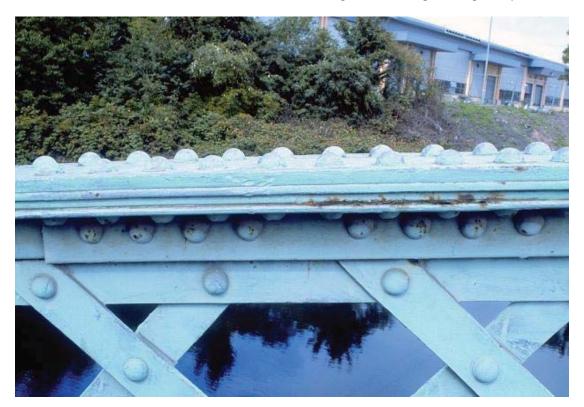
Detailed view of layered steel panels on northern side of City Mill River Footbridge, looking north-west: OL-03507
